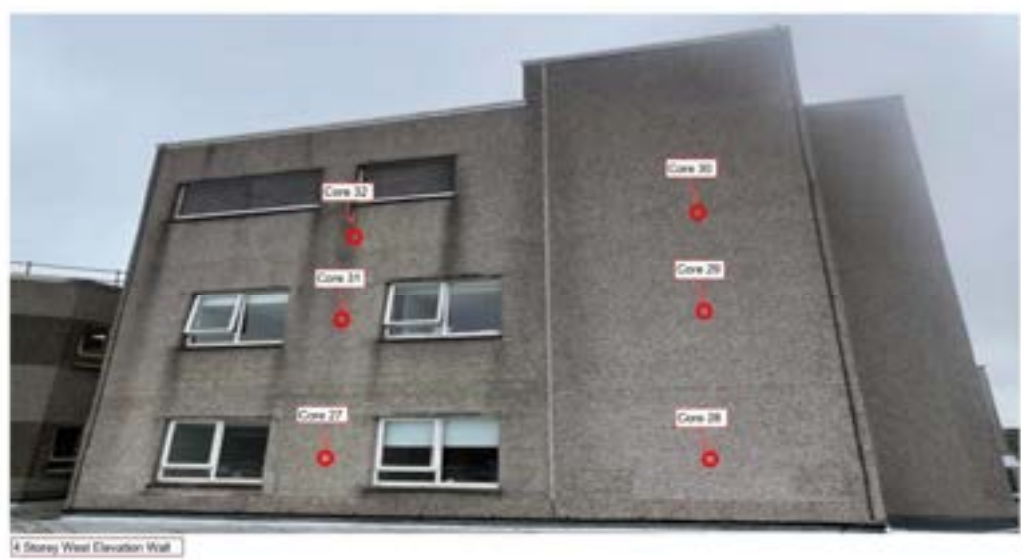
4 Storey west wall cores – 6 no cores at the 4 Storey west elevation wall
